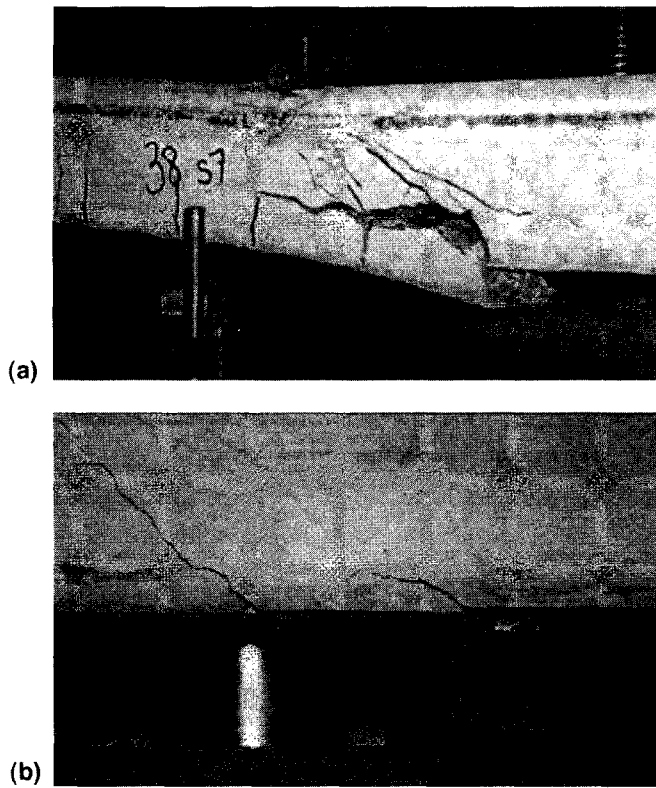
Debonding Mechanisms of Retrofit Beams: (a) Debond at Rebar Layer; (b) Shear Crack Peeling
